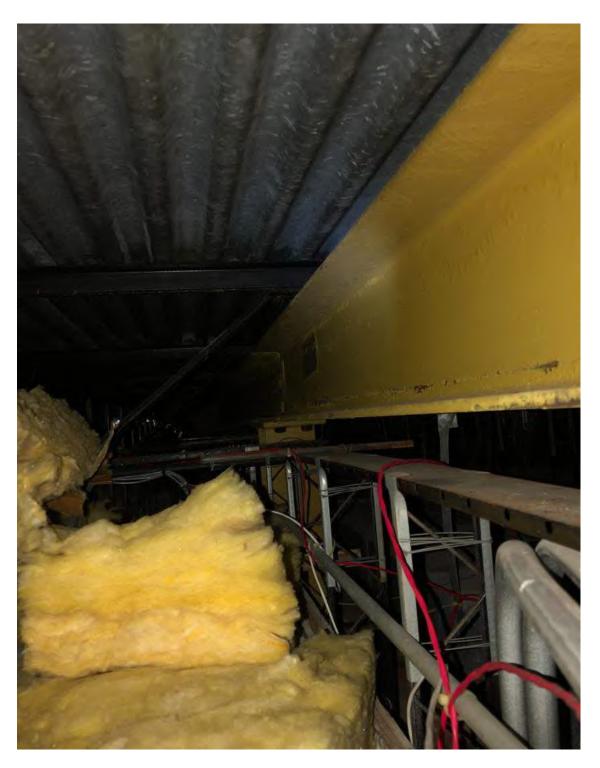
ROOF STEEL BEAM OVER STEEL COLUMN
